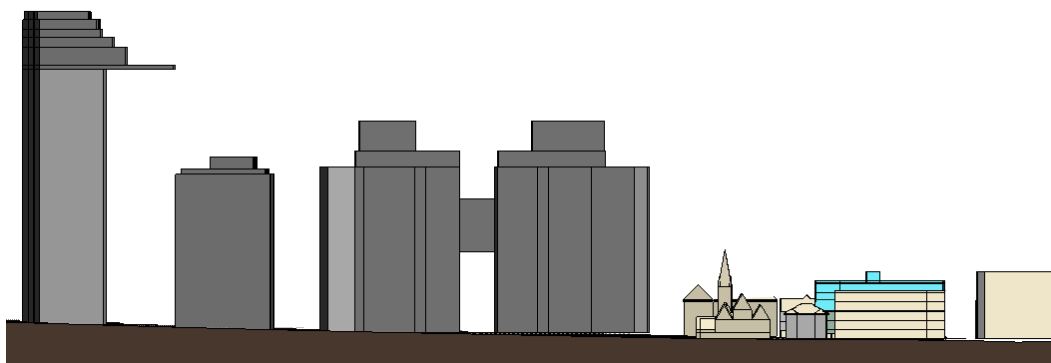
Broadway elevation showing the Proposal (blue) behind a permissible future envelope (light grey) on the corner site owned by the UNDA, and in context with the St Benedict's Church (left) and Frasers/CUB Development (dark grey, far left).
